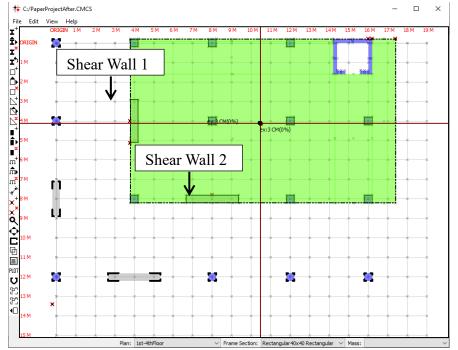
(a): First-Fourth Floor Category CMCS Recommended Shear Walls are Placed
